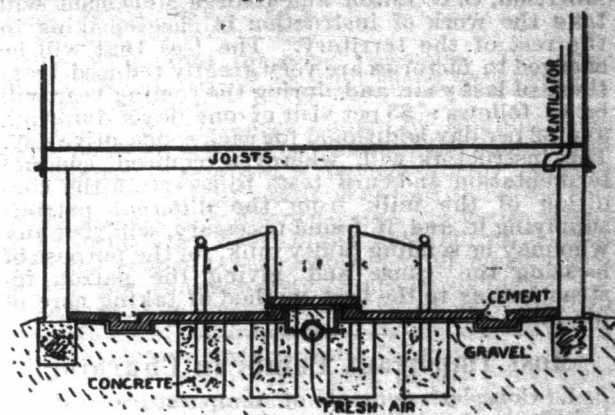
FIG. II.—CROSS SECTION OF BASEMENT, SHOWING USHER'S VENTILATION SYSTEM.
